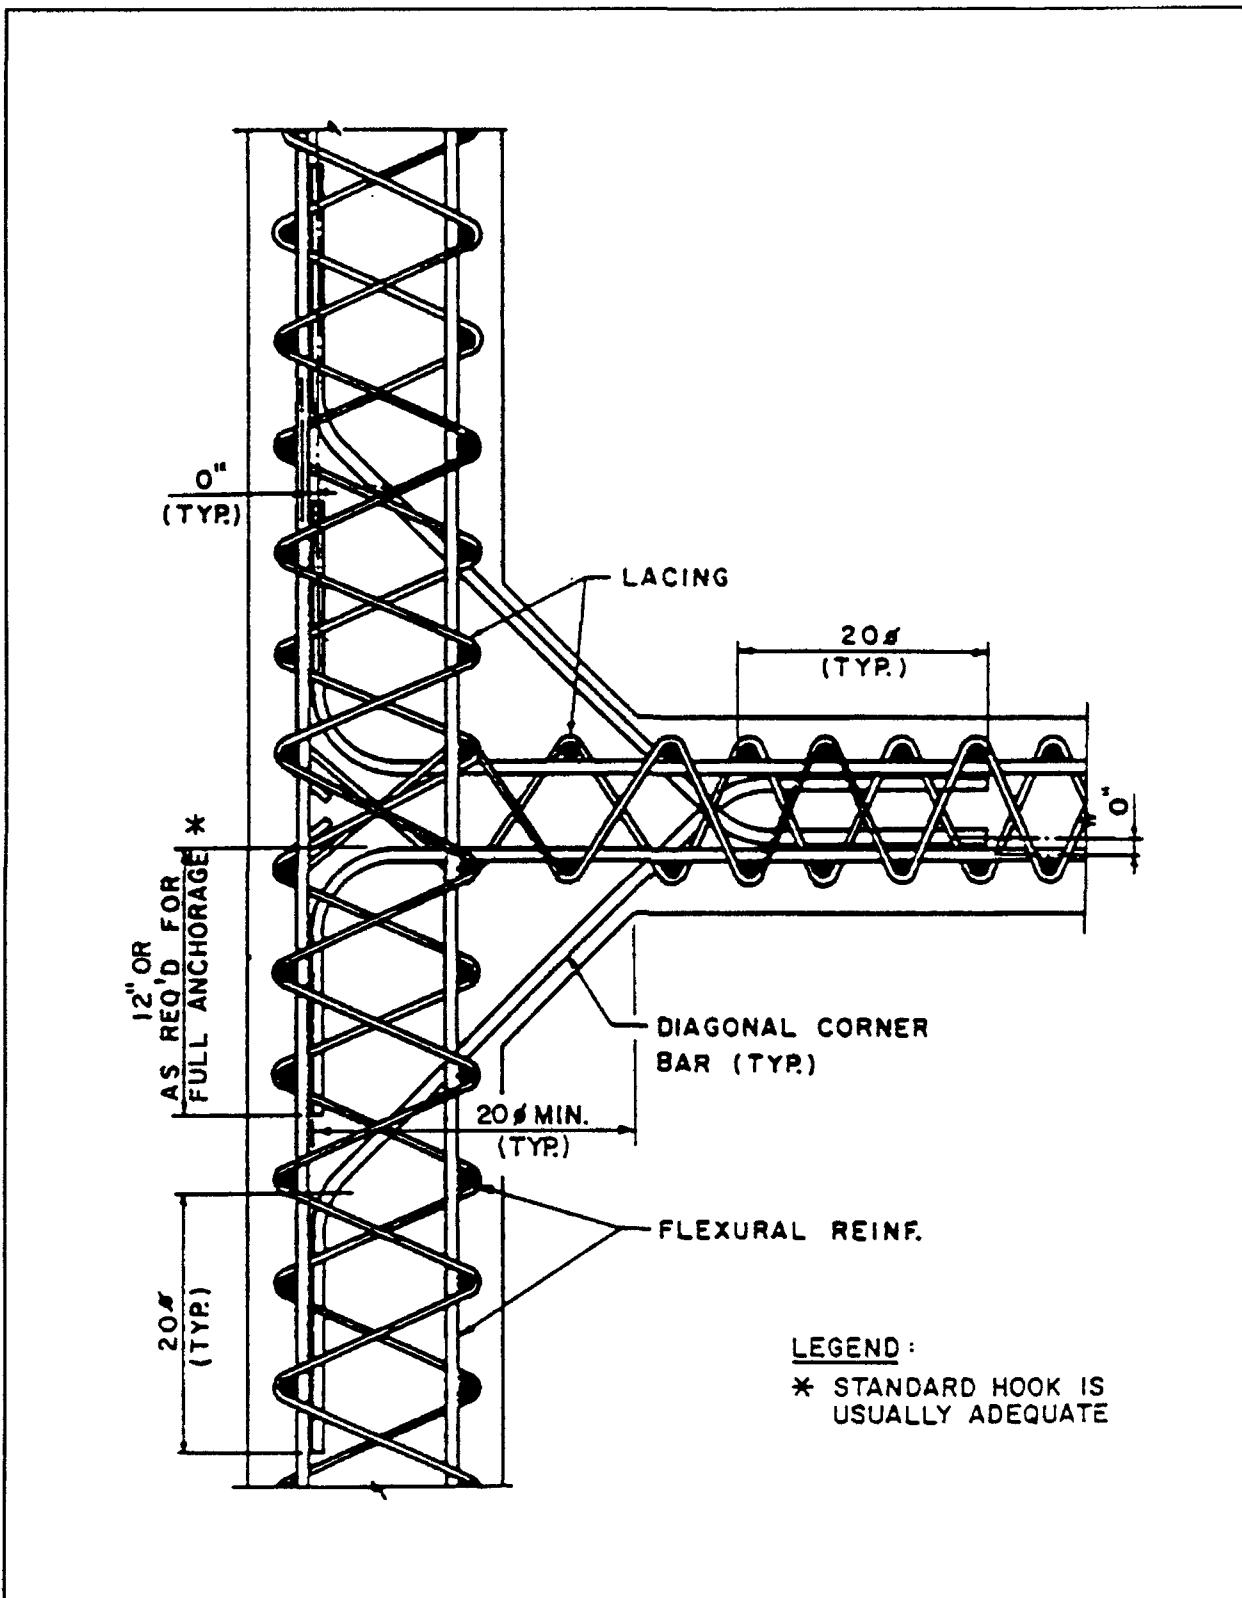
Intersection of continuous and discontinuous laced walls without extensions
